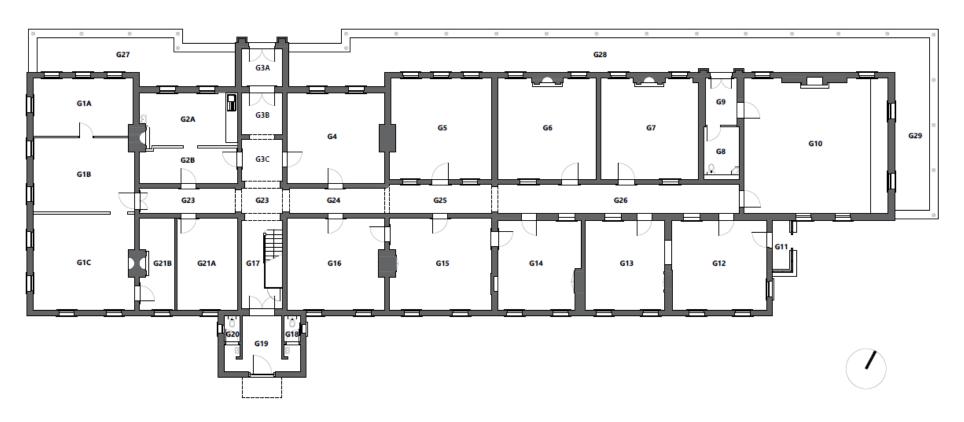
Chief Mechanical Engineers Building – Ground Floor Plan (Source: Curio Projects)
